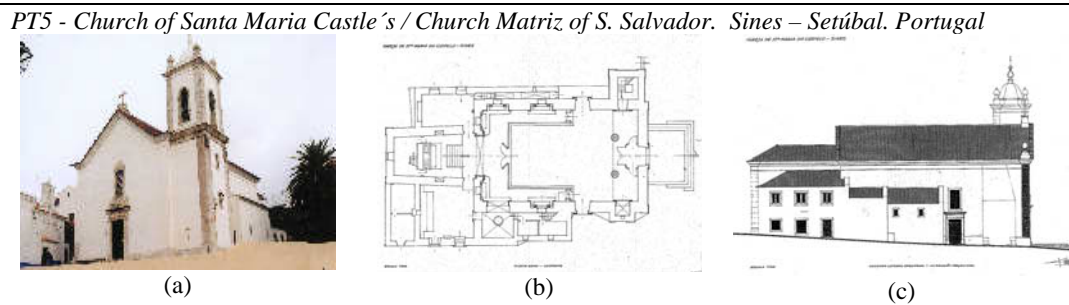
Geometry: (a) photo; (b) plan; (c) lateral North façade.
